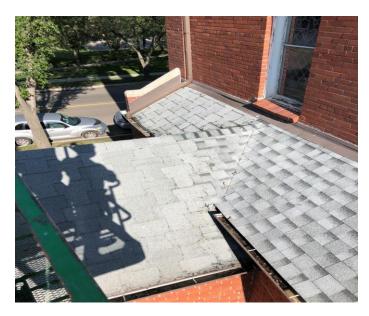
From the August 1 Inspection Report - View of the Shingles on the South West Side (Winnipeg Street)
